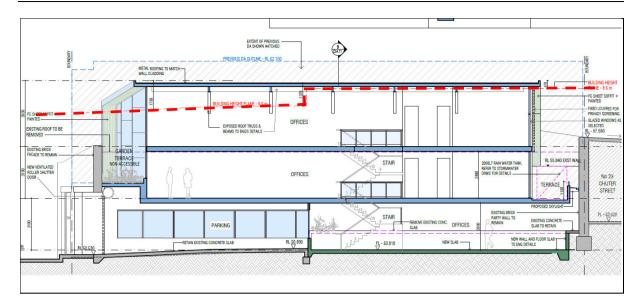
Section through the building. This corresponds with Plan DA10 provided in the attached plan suite. Horizontal red line is the height of building limit line.
